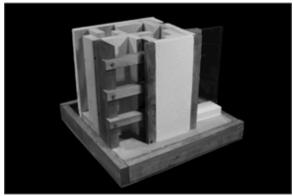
Building detail - Corner of wall at window (P. Mckissack)
